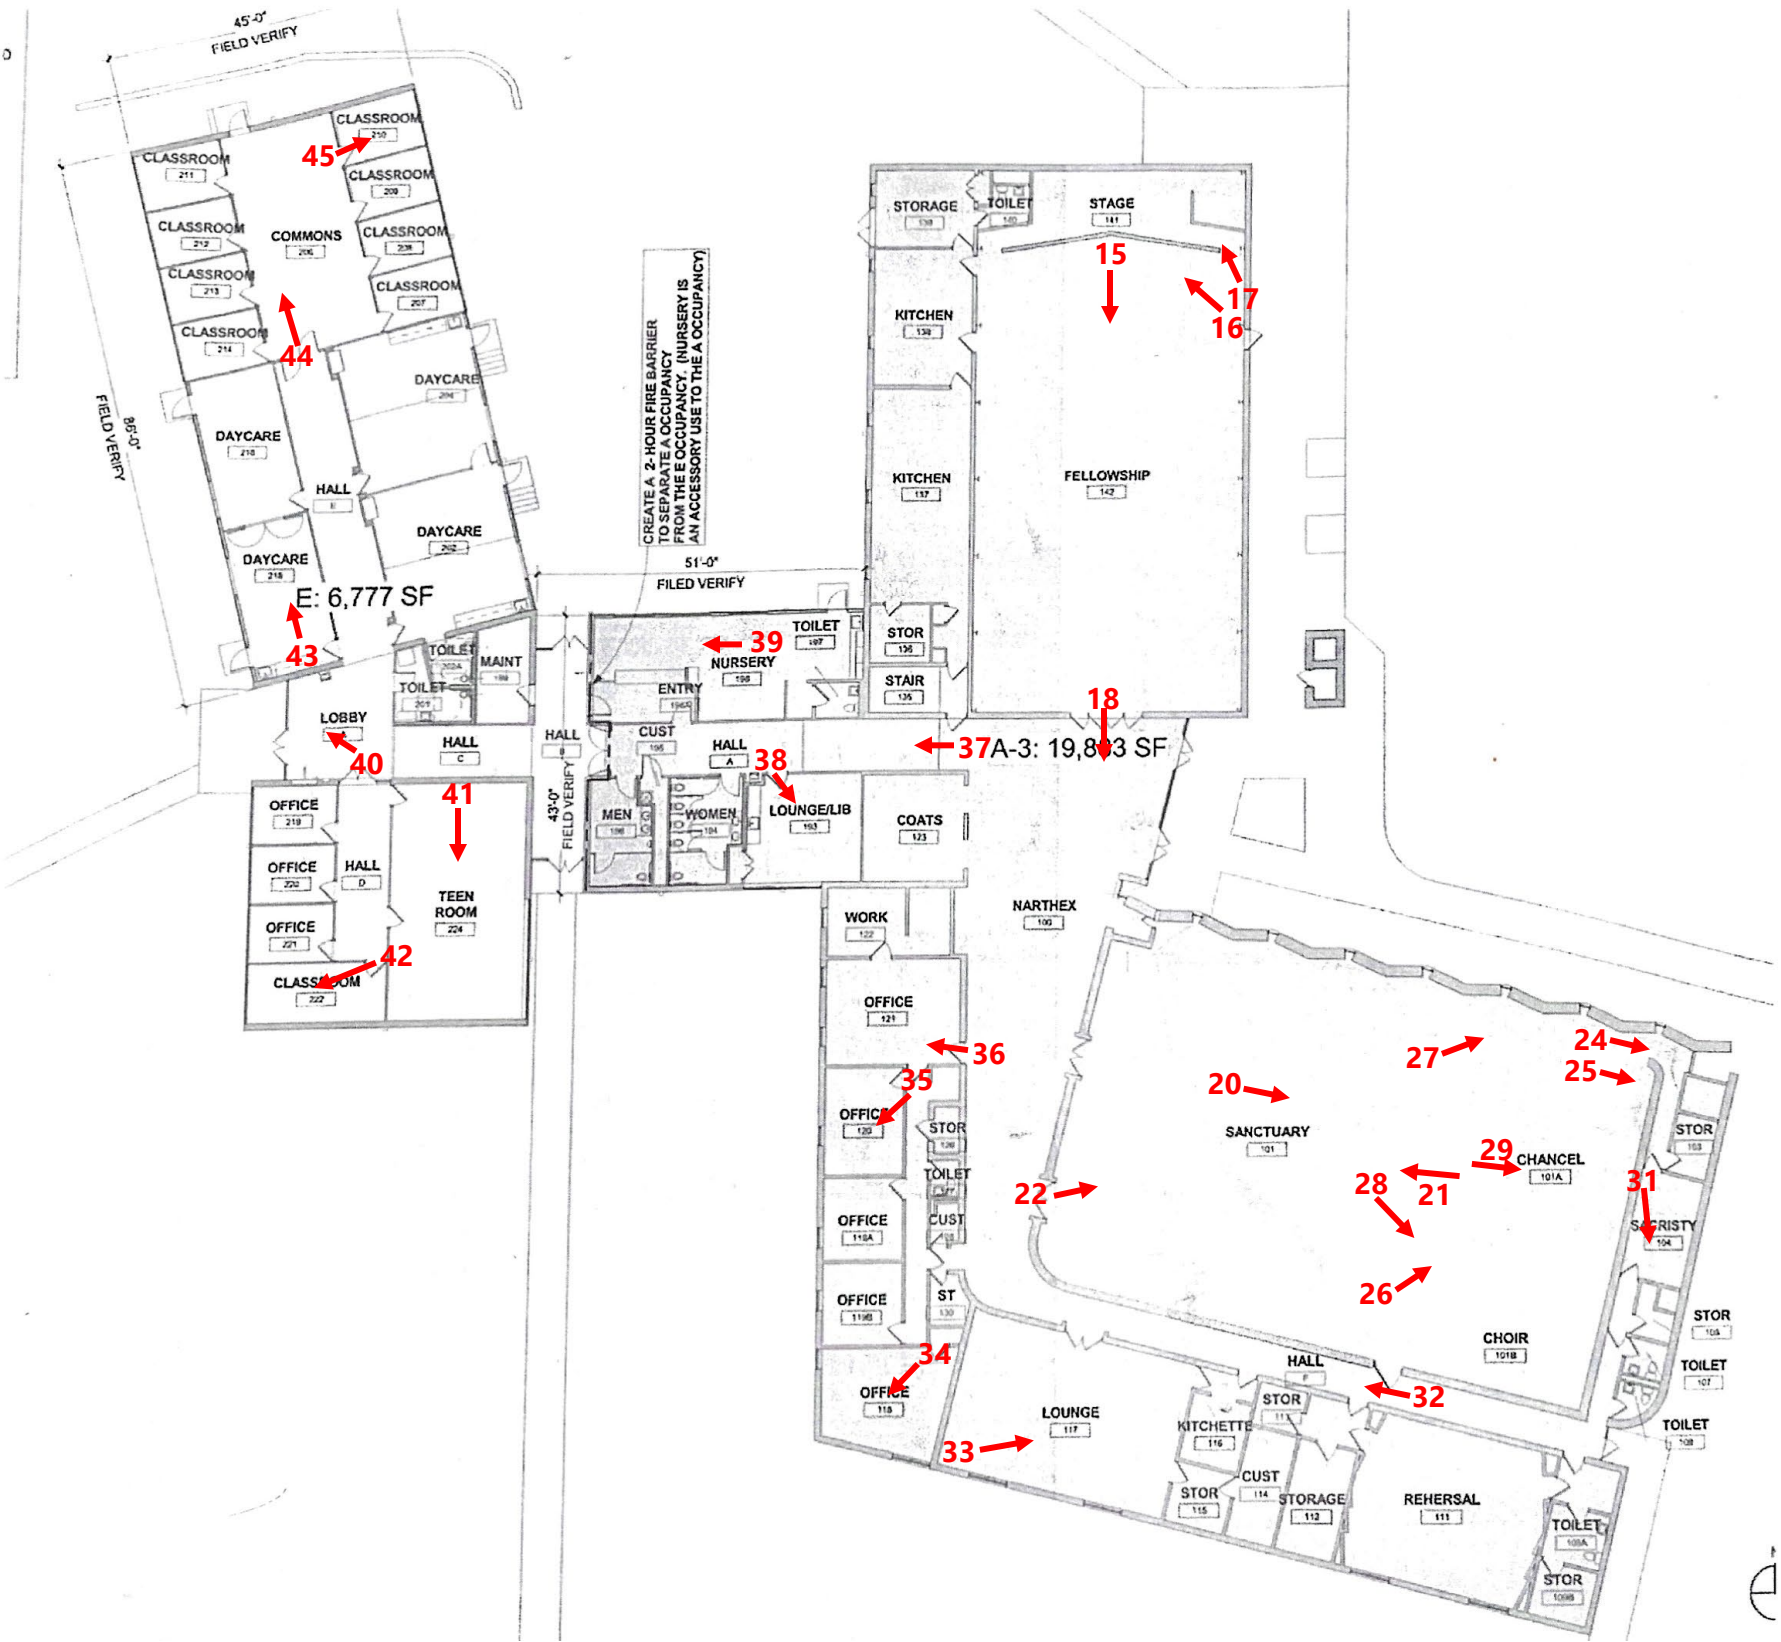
CURRENT FLOOR PLAN, WITH PHOTO KEY
